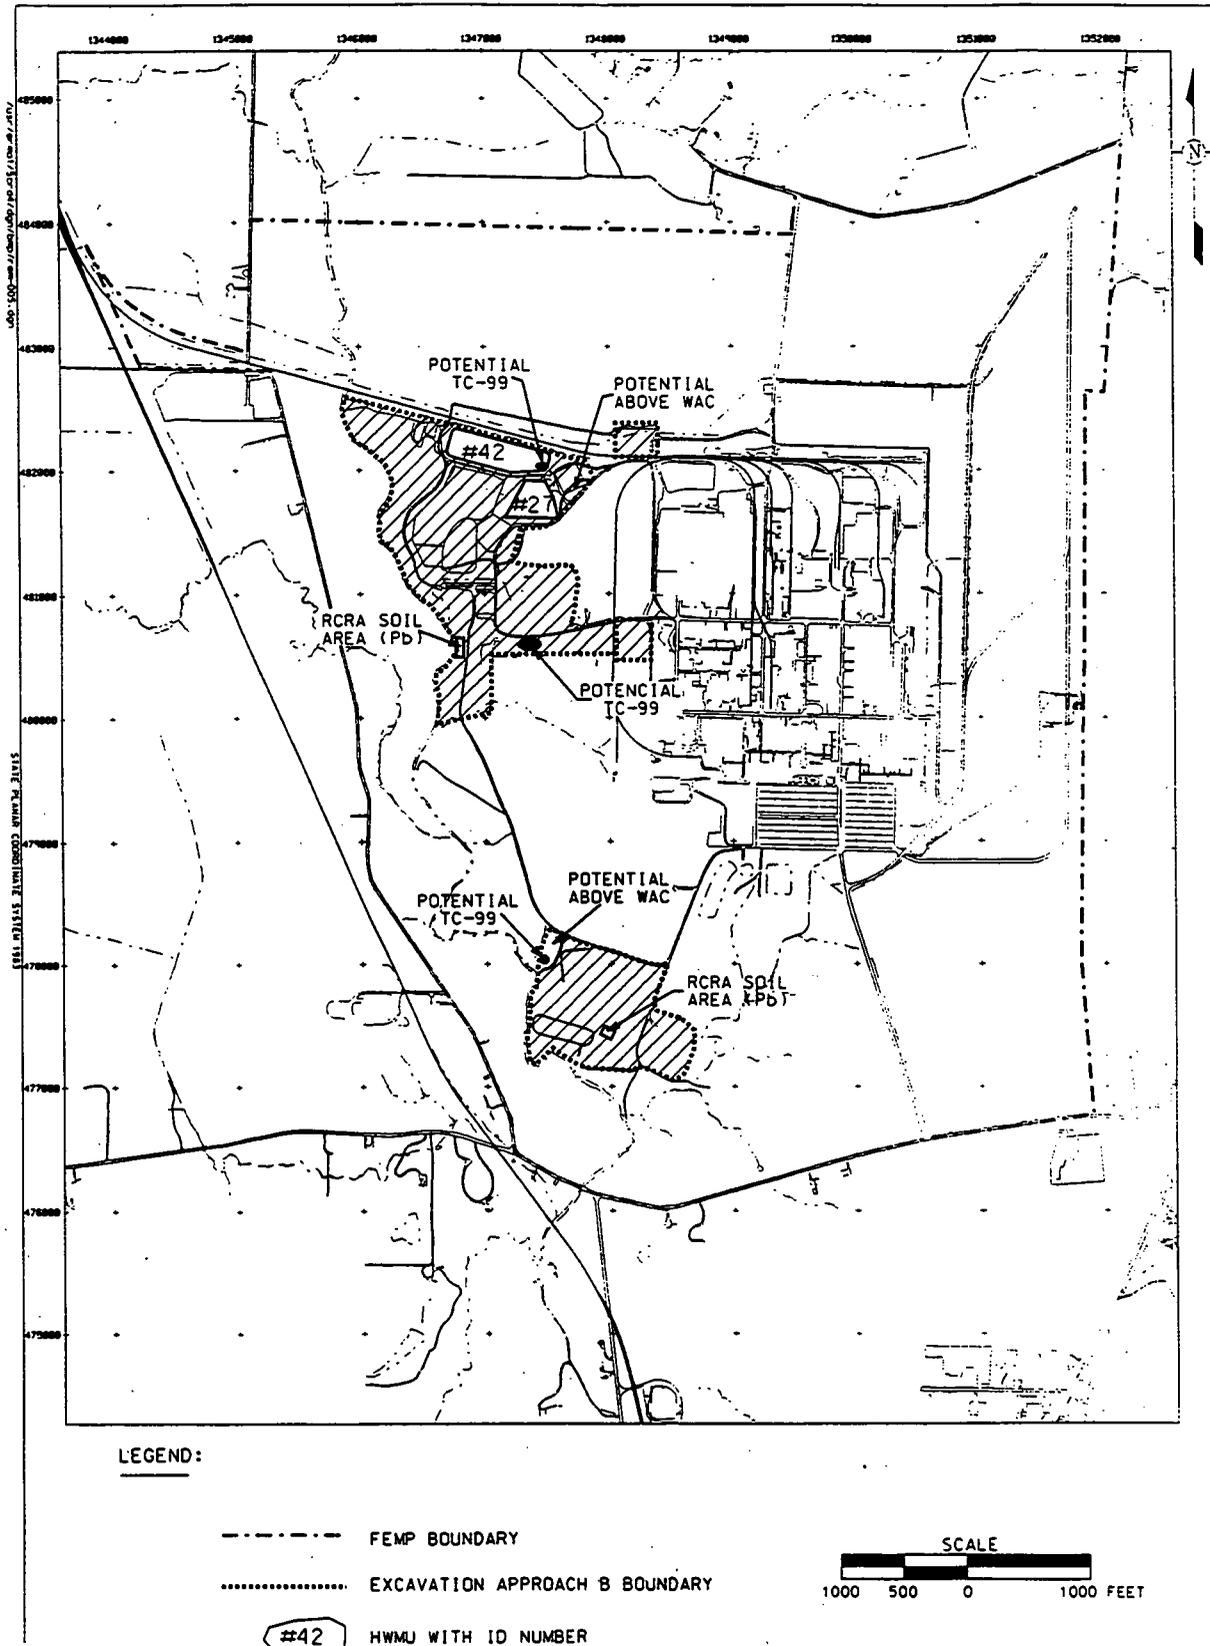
Estimated Excavation Areas for Excavation Approach B
